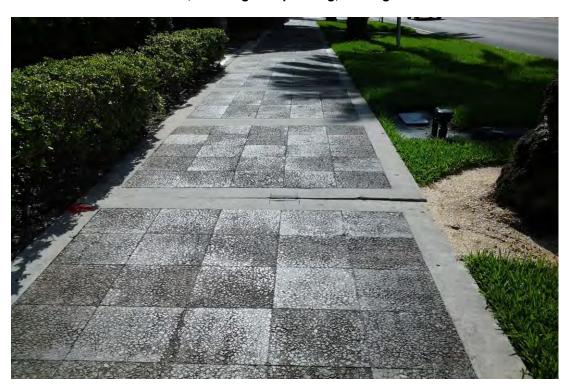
North side of 96<sup>th</sup> Street, sidewalk settling at joint, looking east.
